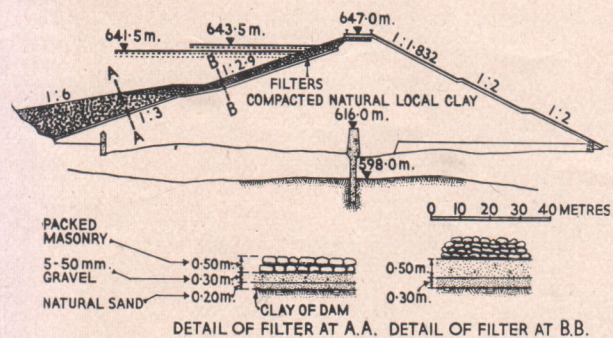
Final design of Cubillas dam (third project) as now under construction
